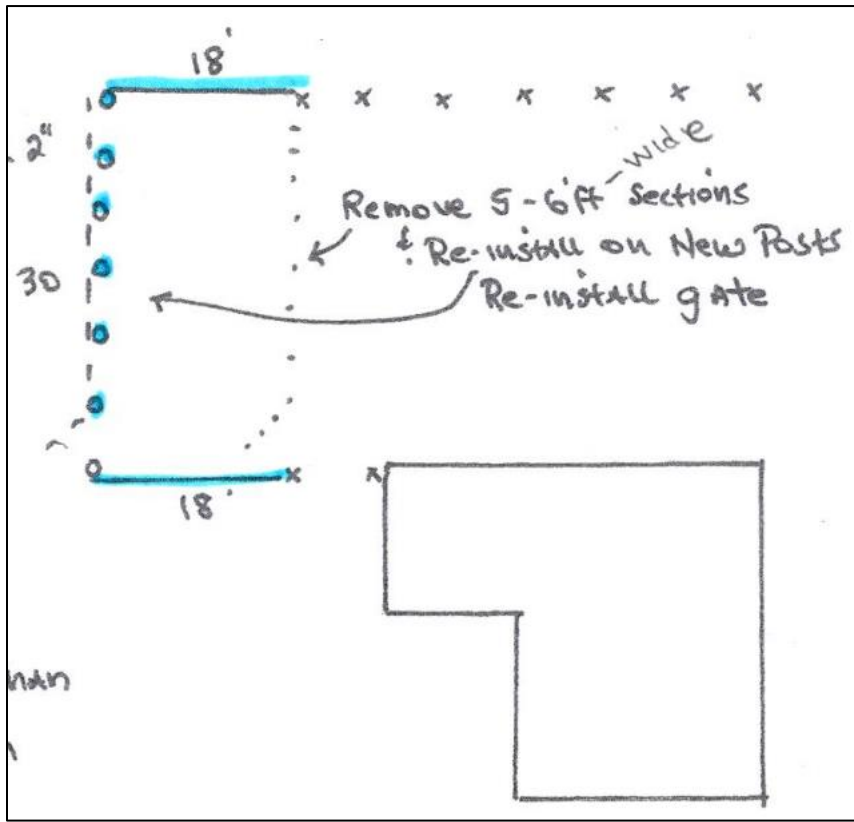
Site plan showcasing relocation of fence line towards Pike Street.
